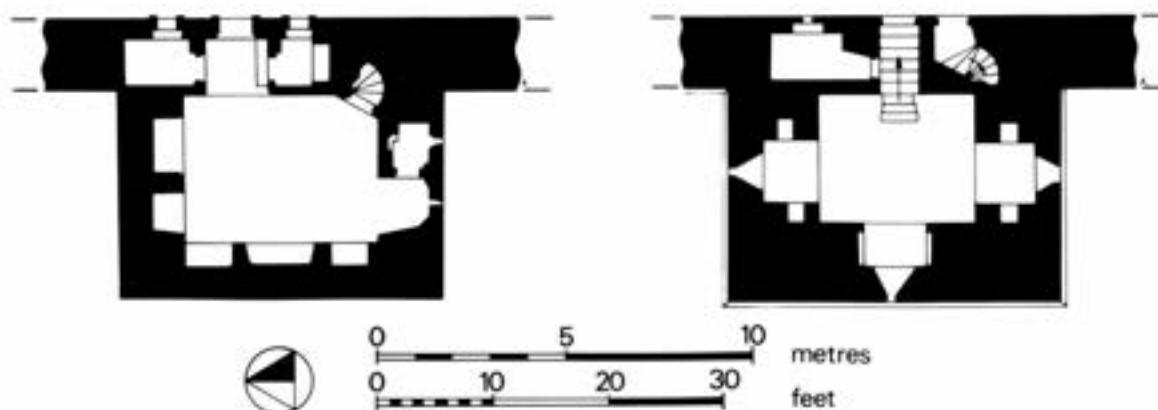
The Tile Tower; plans at ground (right) and first floor (left) levels
